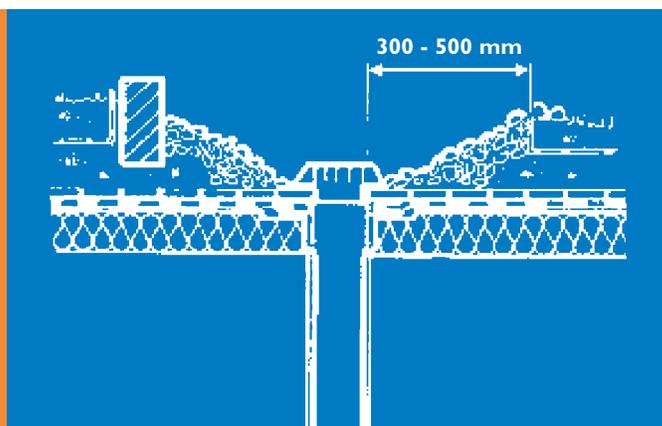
Gravel Skirt and Vegetation Barrier Around Roof Drain
